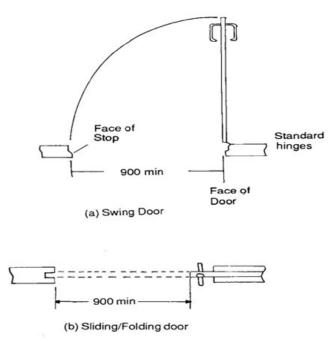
1: The minimum clear opening at doors (source: Building and Construction Authority, 2002).
